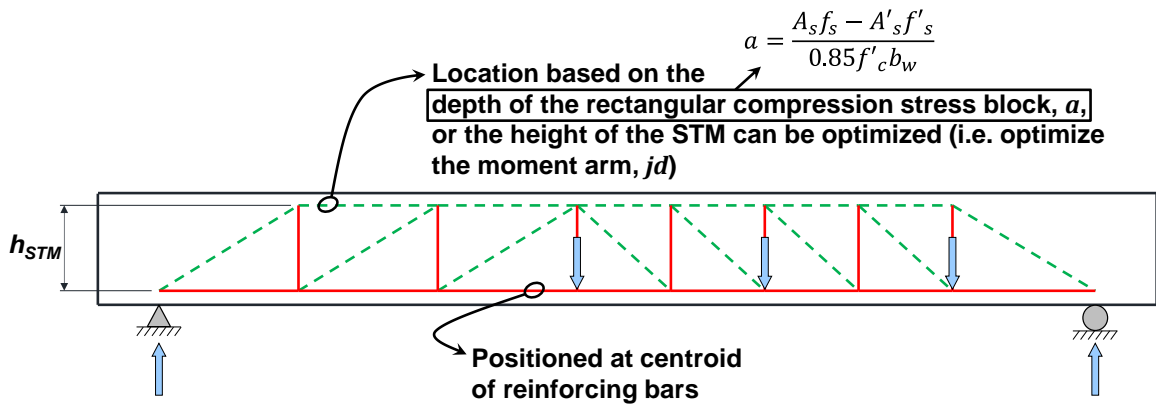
Placement of the longitudinal ties and prismatic struts within a strut-and-tie model
